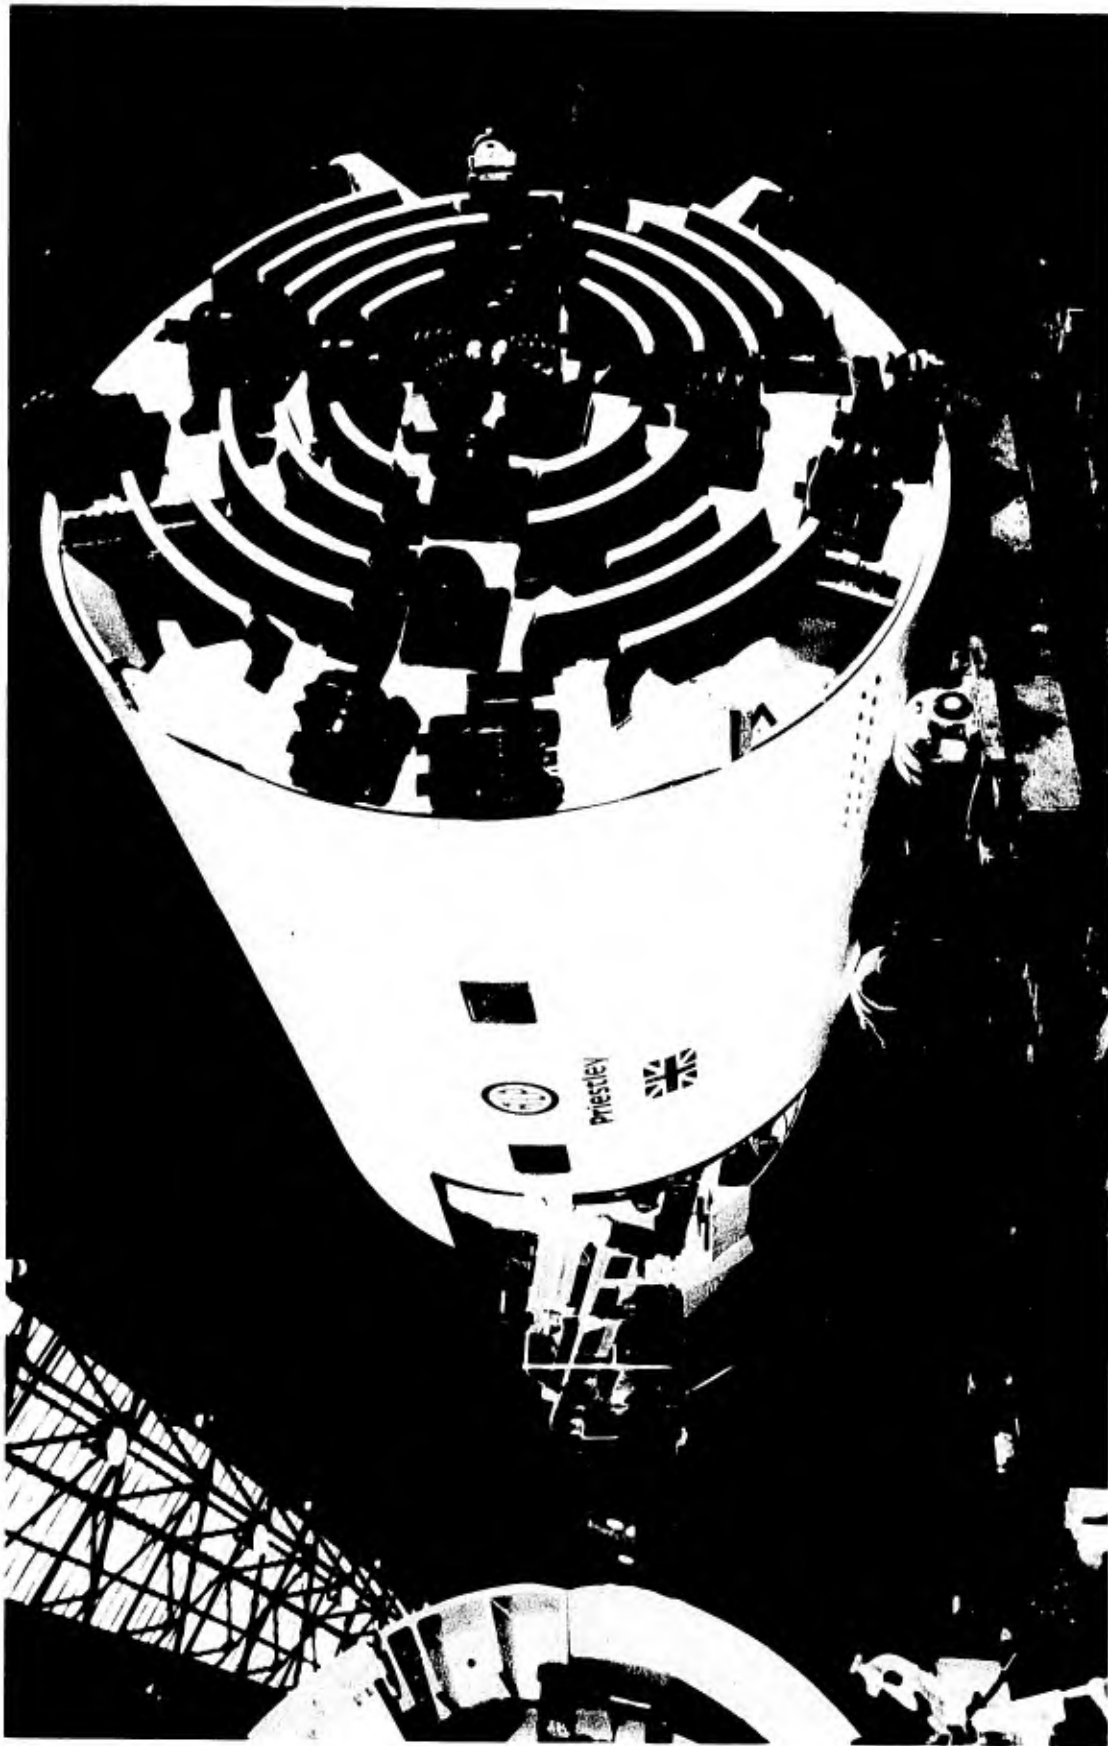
Shielded full-face tunnel boring machine for rock tunnels; note face construction details with concentric ring grill bars to prevent blocks from sliding out and jamming in muck buckets or between cutter discs (courtesy of Robert Priestly Ltd.)
